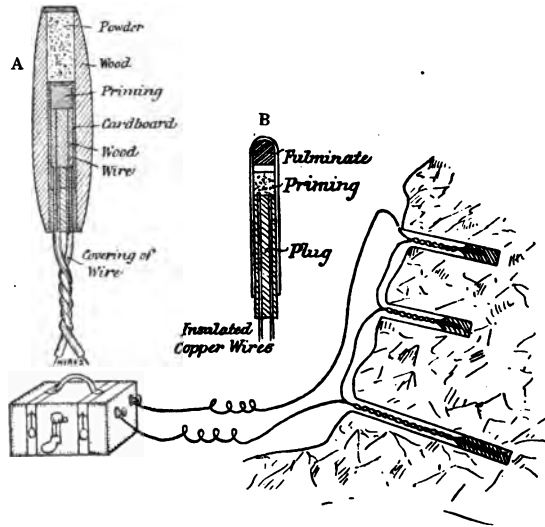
High-tension blasting. A, section of detonating-cap for dynamite, half real size.
